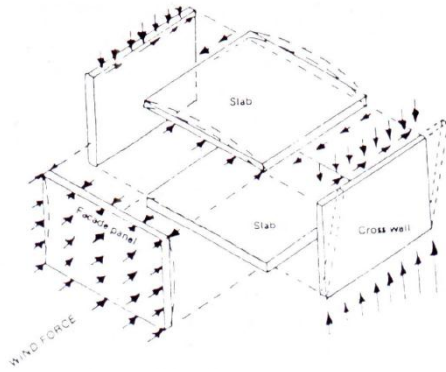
Transferring of lateral loads (wind load) from out-of-plane walls, through the rigid slab to the shear walls (from Hamid 2009).
